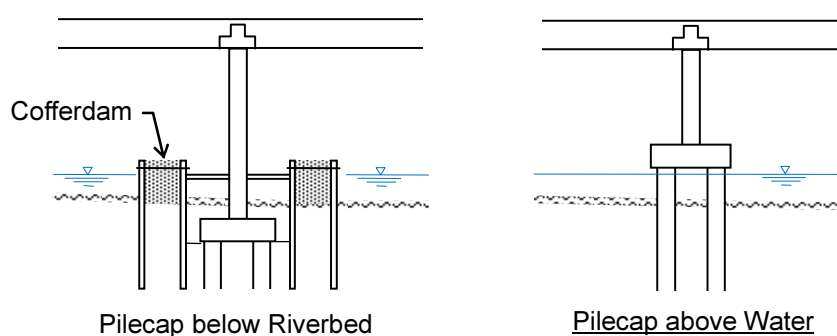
Alternative Design Proposed for Overpass Bridge
